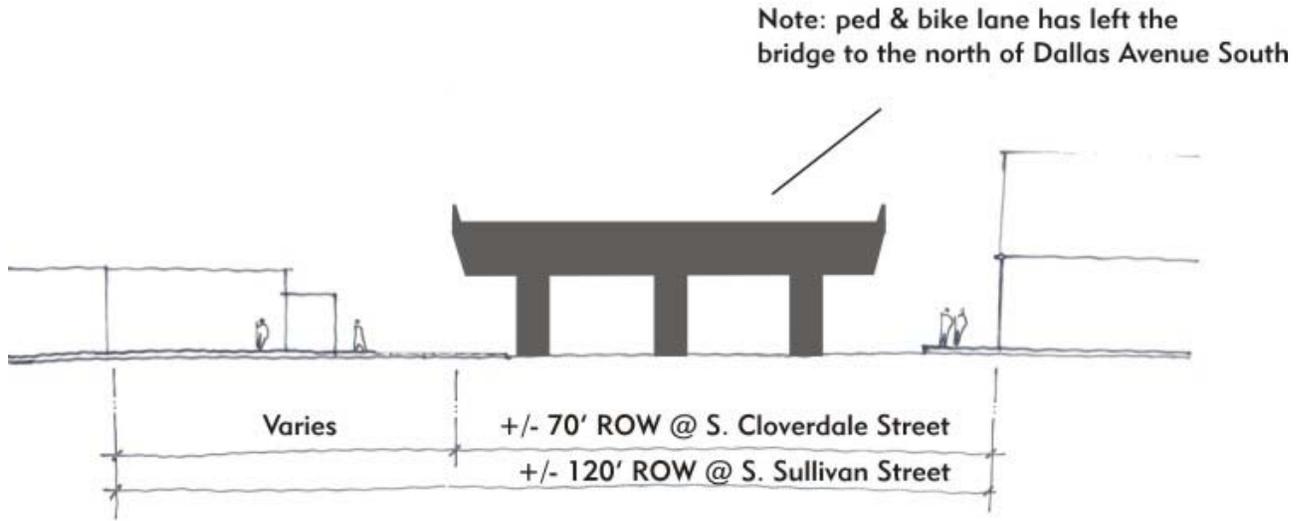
Mid-Level Fixed-Span Bridge Alternative at S. Cloverdale Street and S. Sullivan Street
